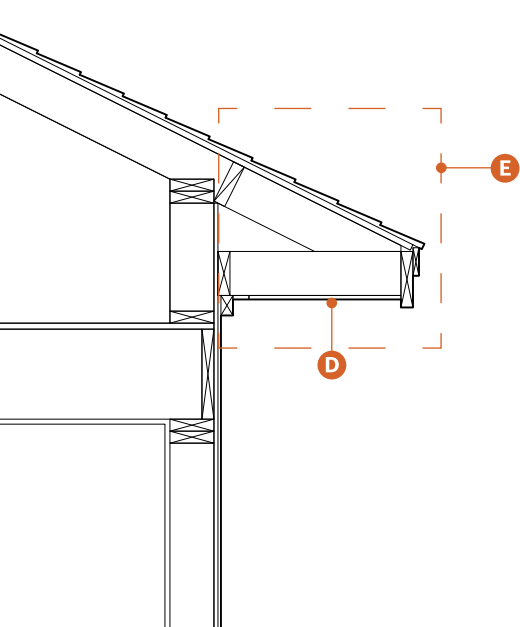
Section Detail of Highest Eave for Pitched Roof
